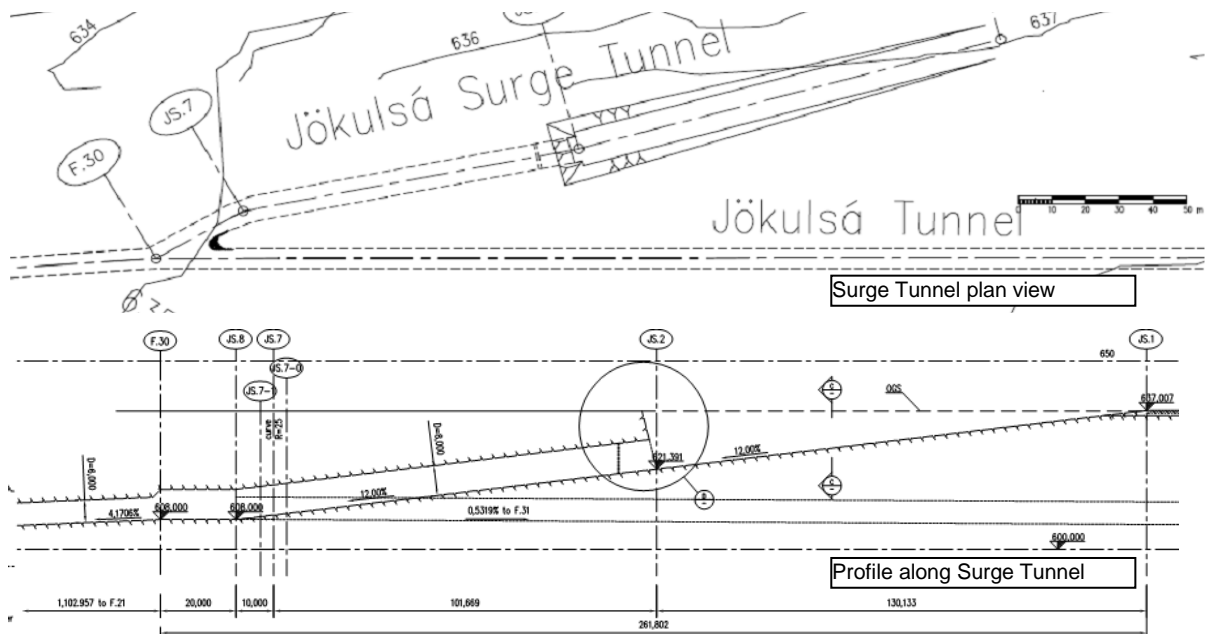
Jokulsa Surge Tunnel and the canal plan view [5]
